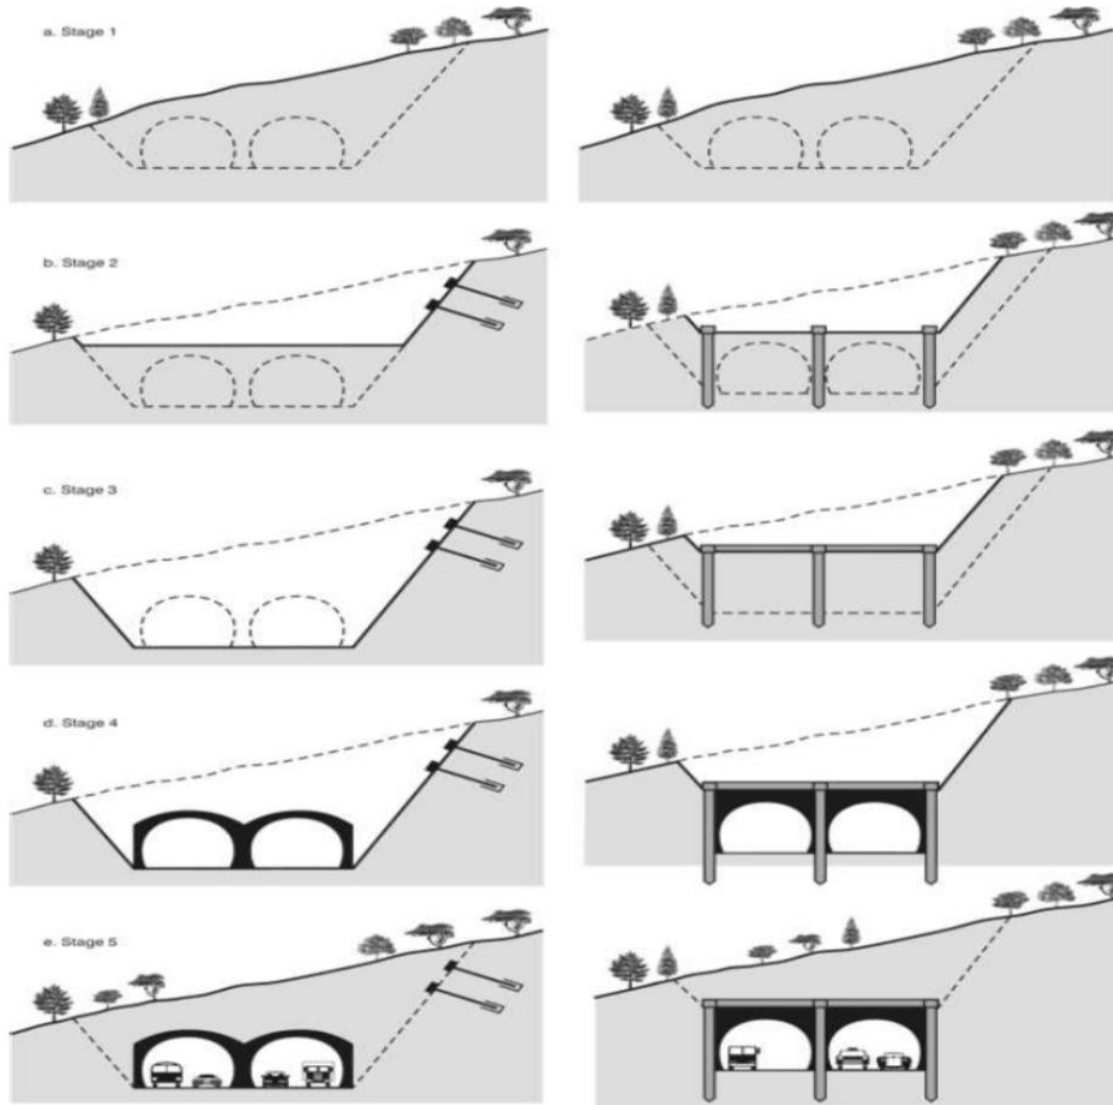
Stages of Construction for the "C&C Techniques (cut and cover on left, cover and cut on right)
